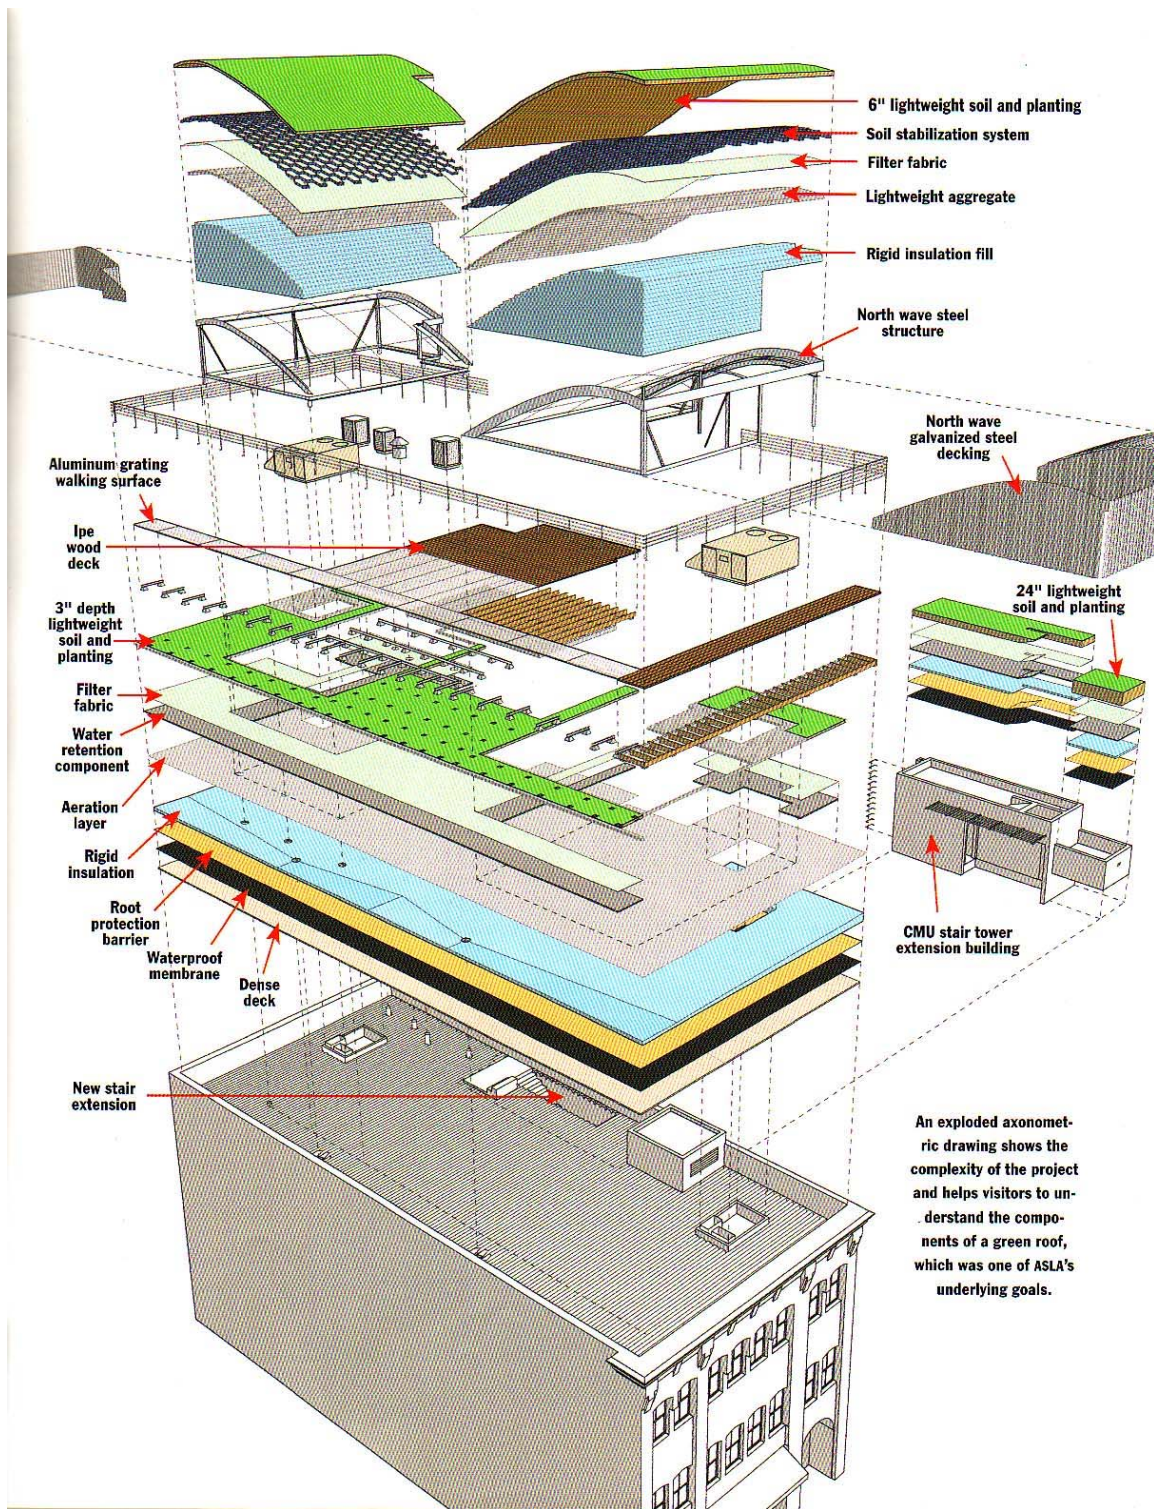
Exploded axonometric drawing. Courtesy MVVA
